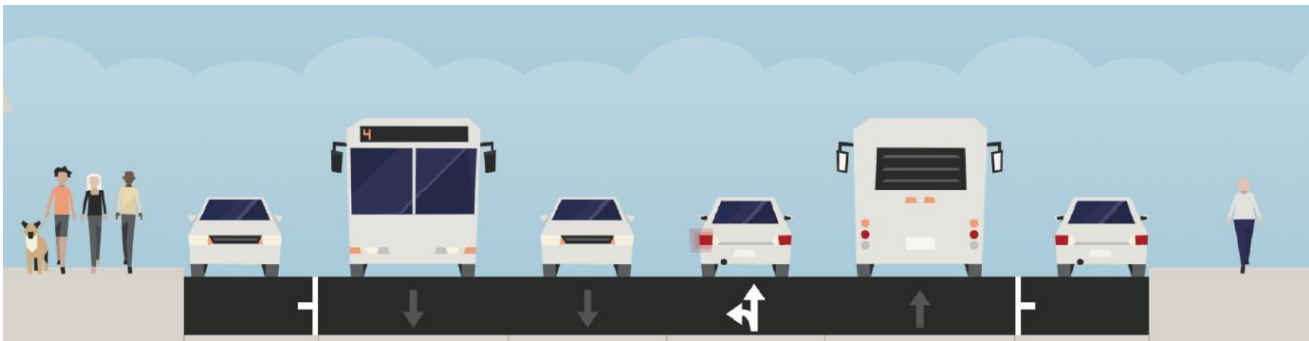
Proposed cross-section: California between Presidio and Steiner streets. The curbside travel lanes would become temporary emergency transit lanes.
